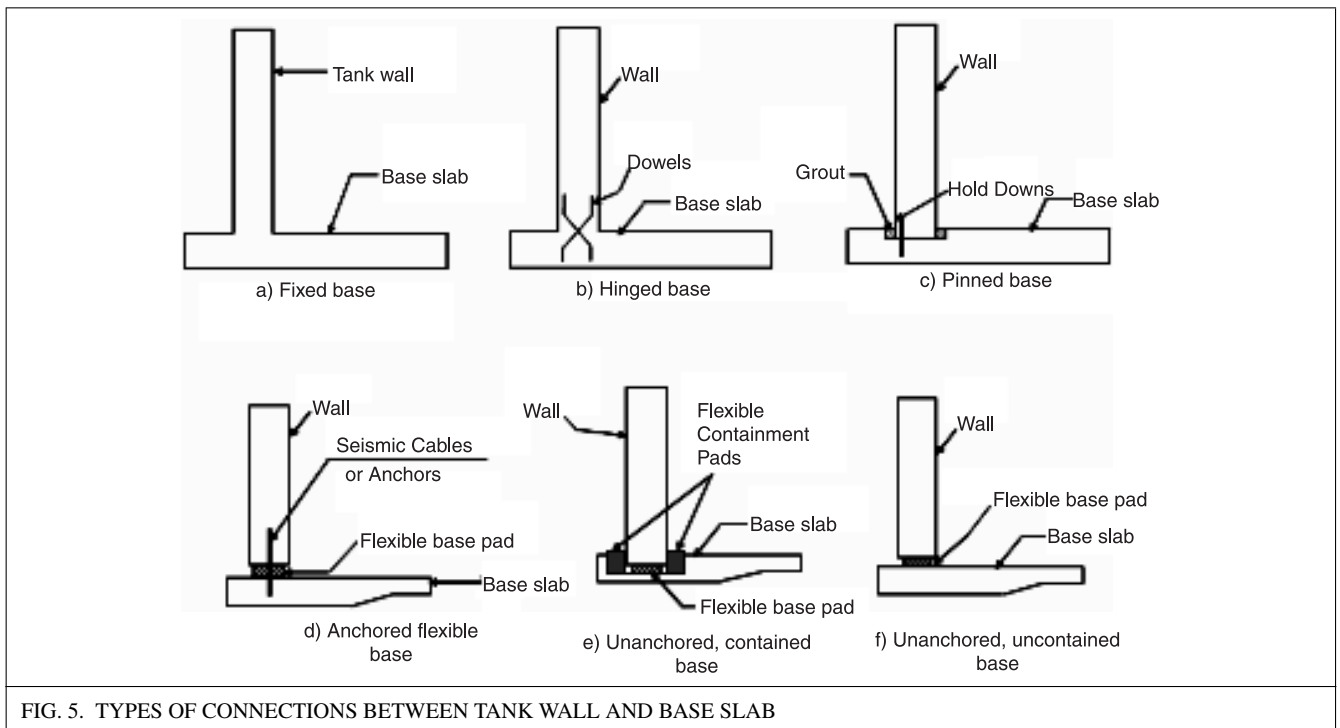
TYPES OF CONNECTIONS BETWEEN TANK WALL AND BASE SLAB
